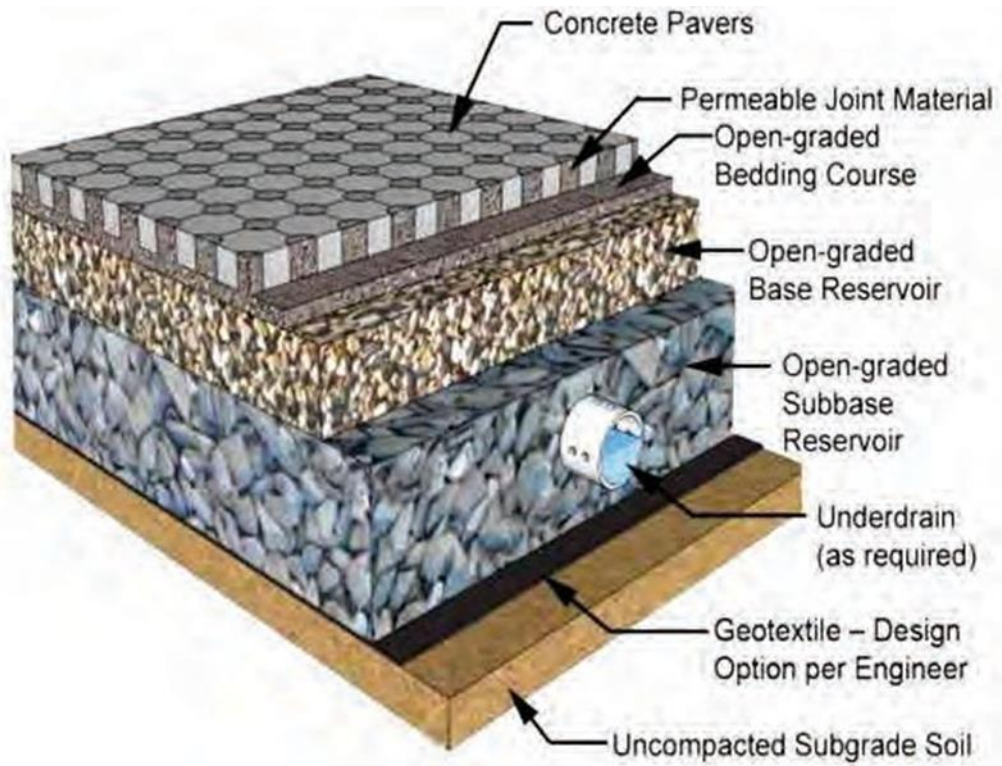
Cross-section of permeable pavement (source: ICPI).
